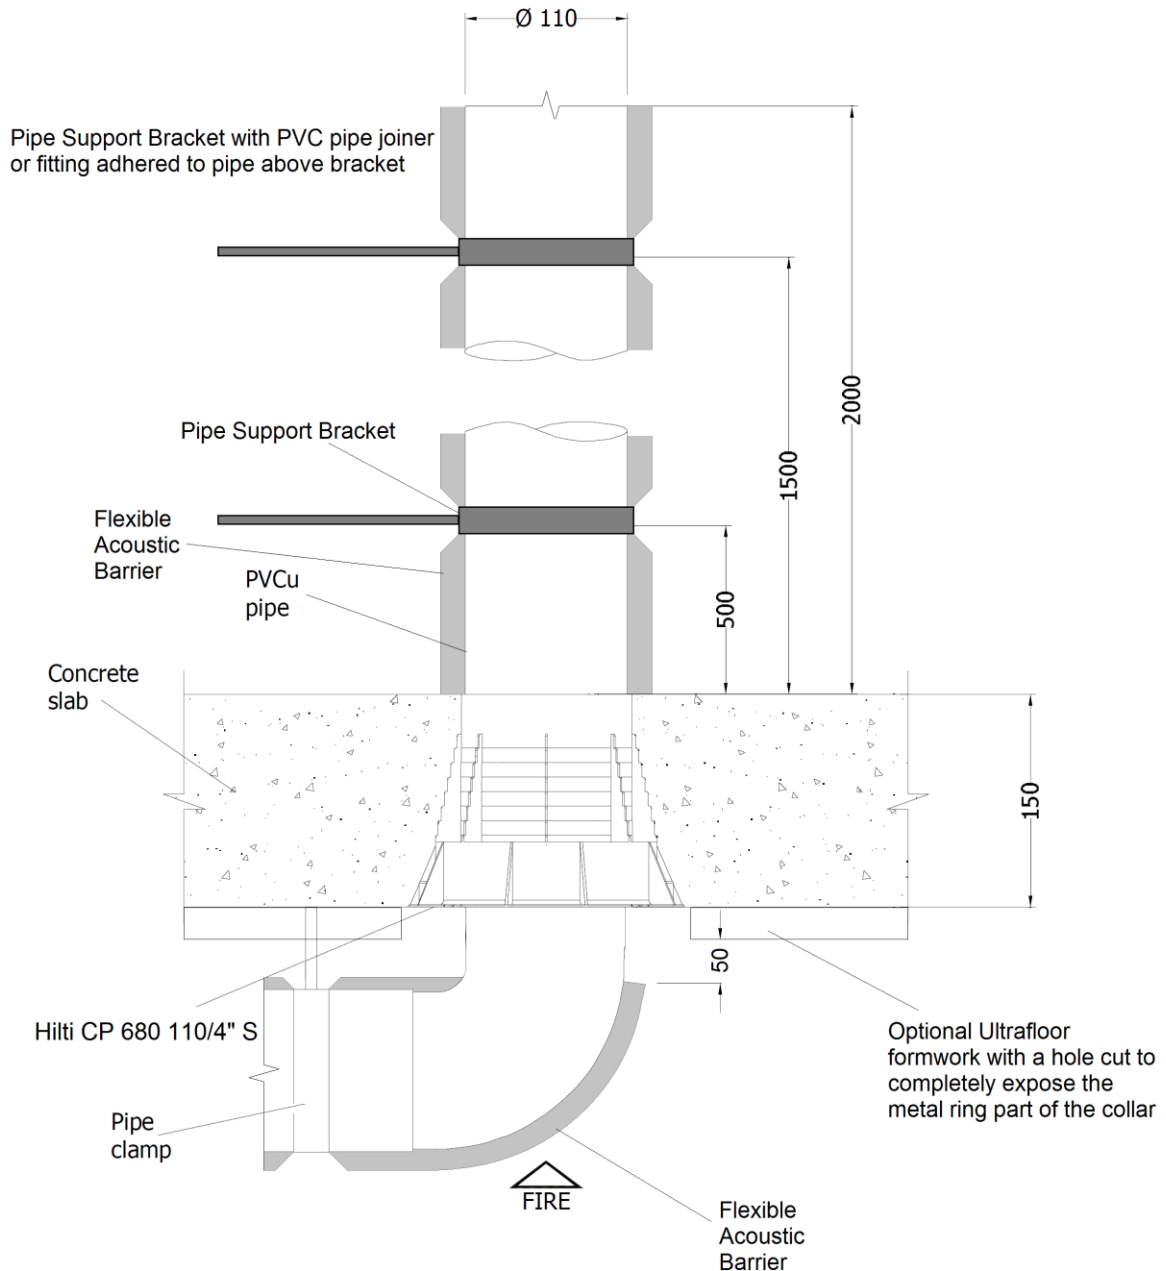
uPVC pipes flange of elbow fitted outside firestop collar protected with Hilti CP 680 110/4" S Cast-In Firestop Collar with Ultrafloor, optional flexible acoustic barrier at least 50mm from underside of Ultrafloor
